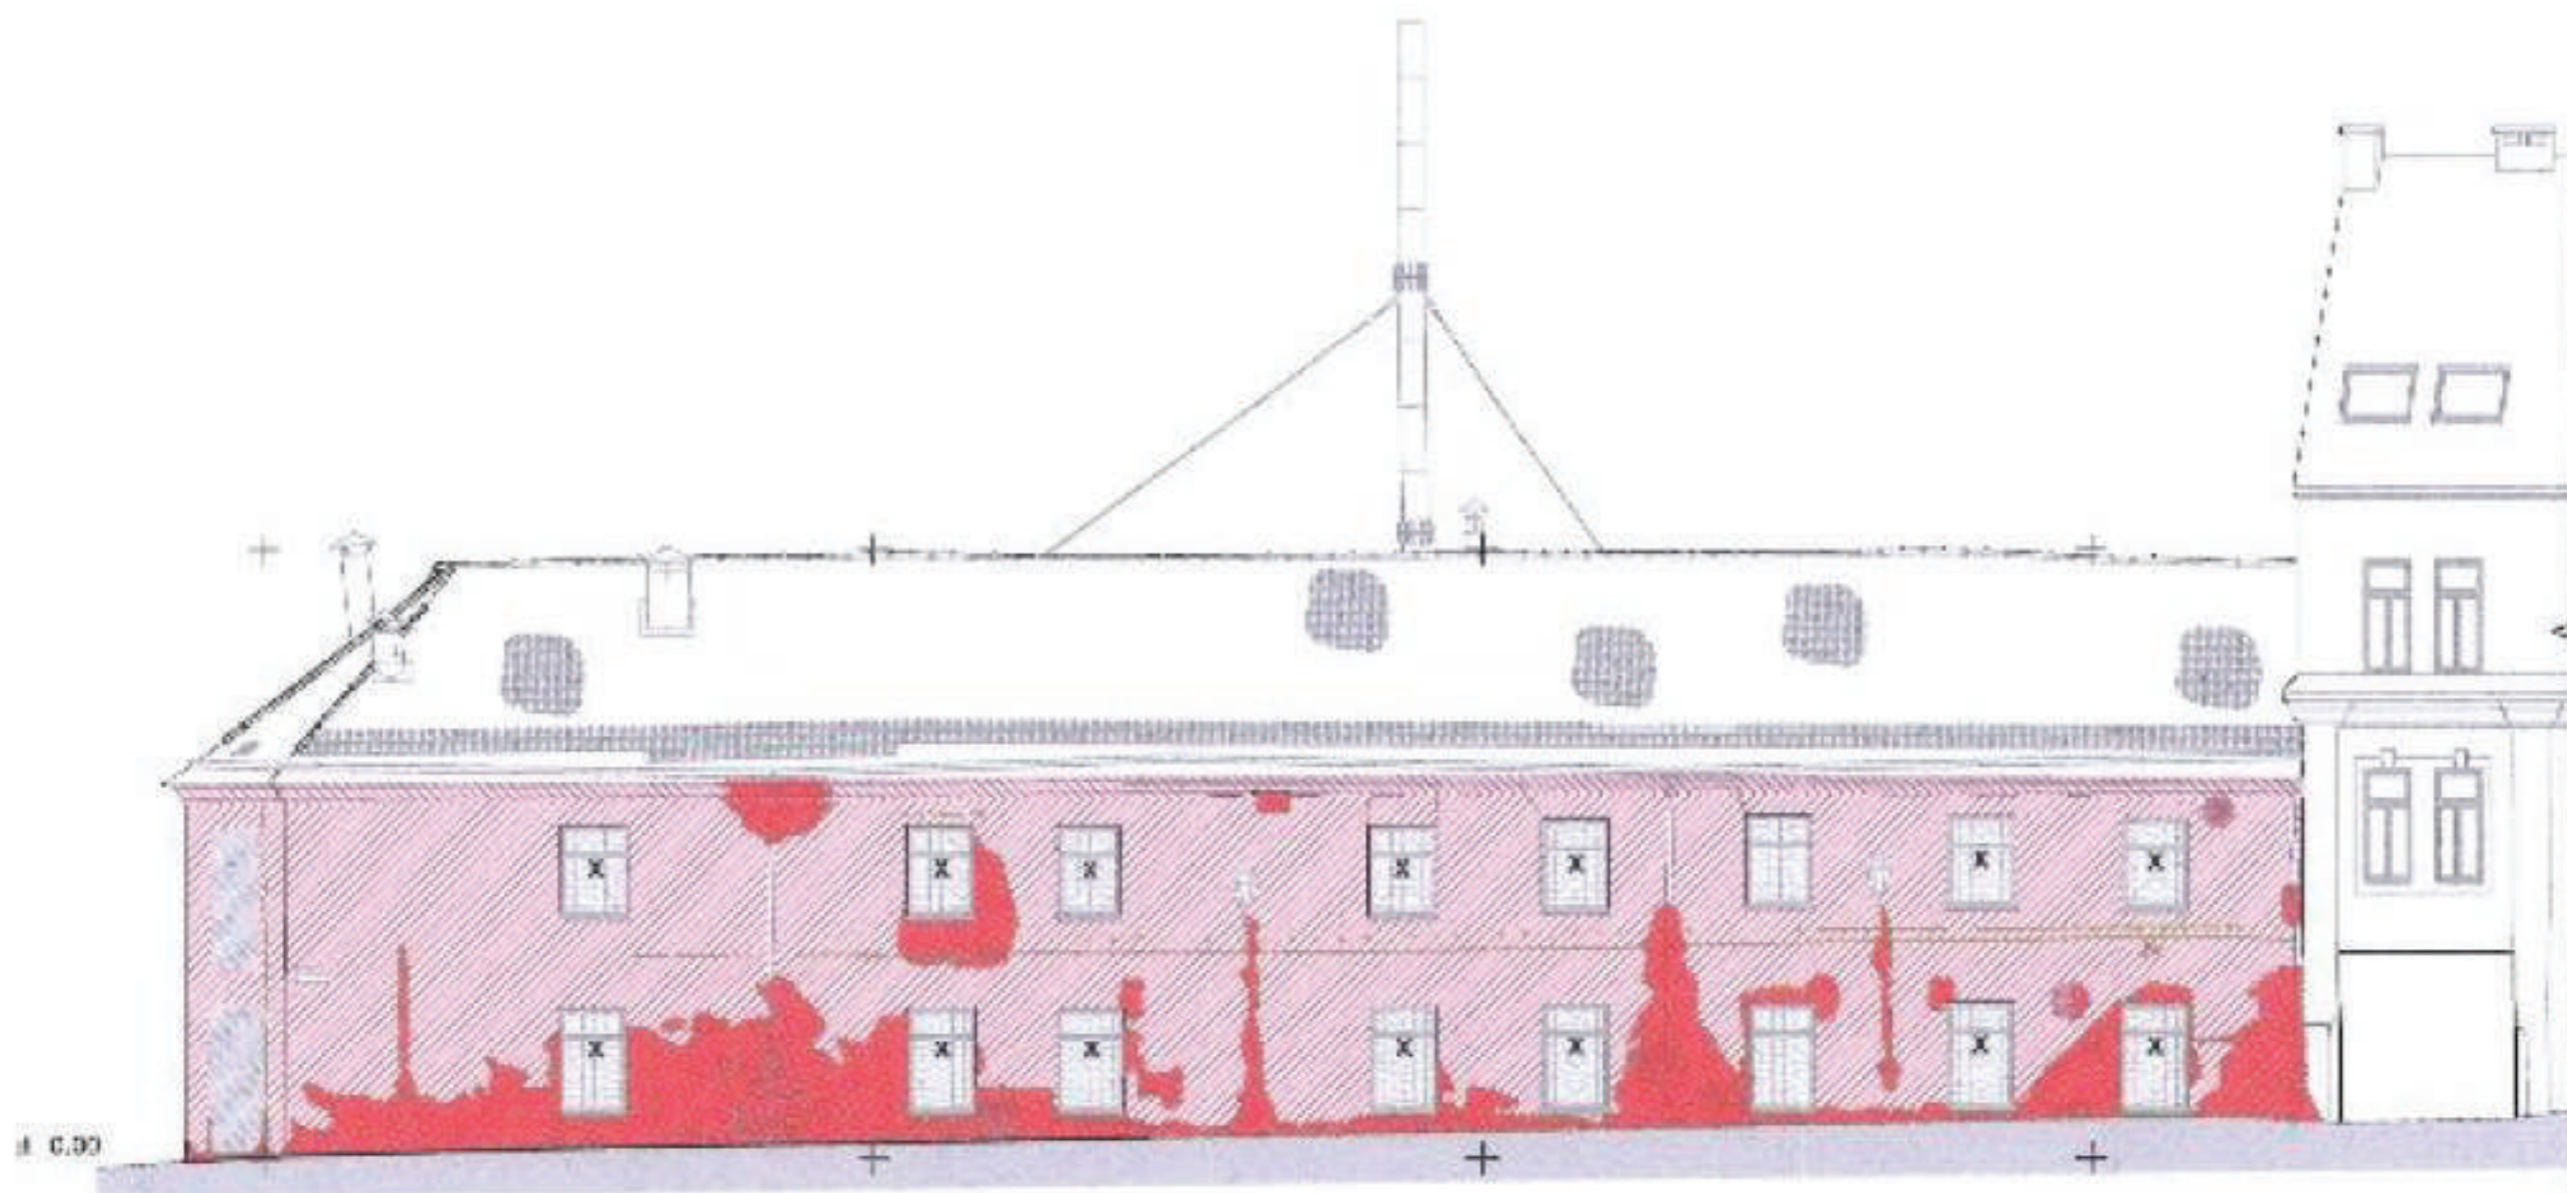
Research of Latako Street facade before restoration: damage to plaster and masonry was noted.
